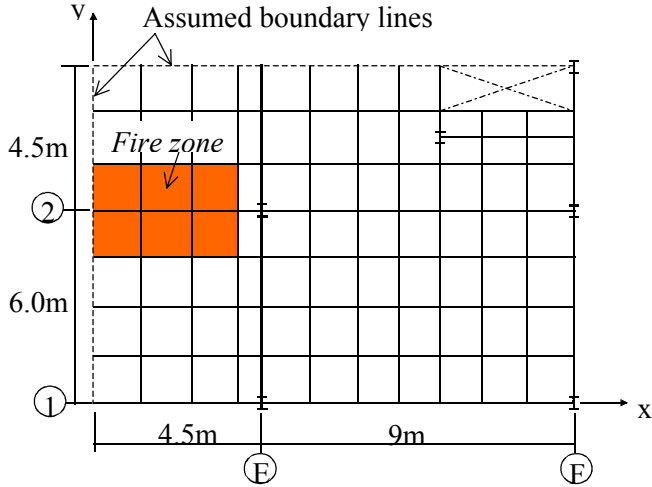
Finite element layout for analysis of the Restrained Beam test.
